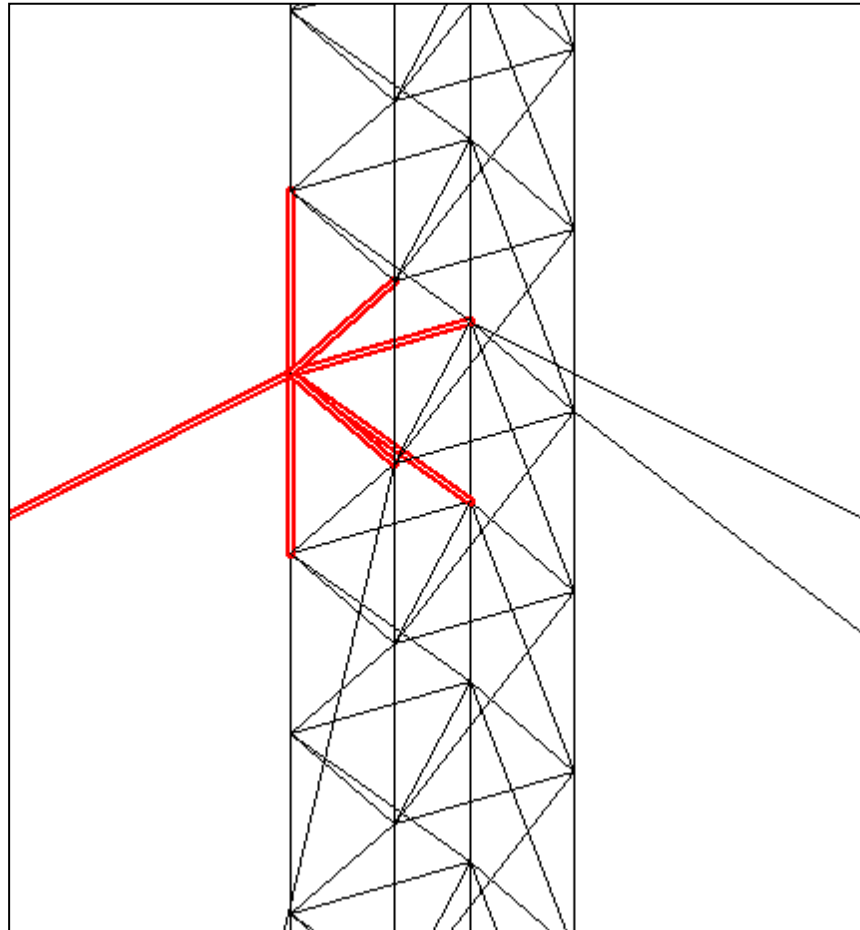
Beam stresses at third intersection of guy cables and tower 75m from base
